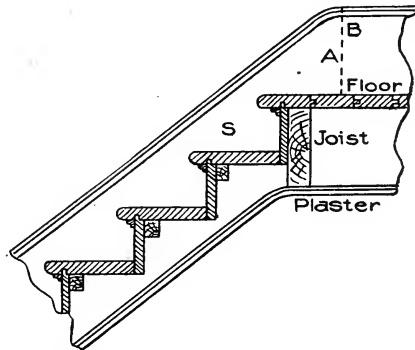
Showing How Wall String is Finished at Top of Stair.
